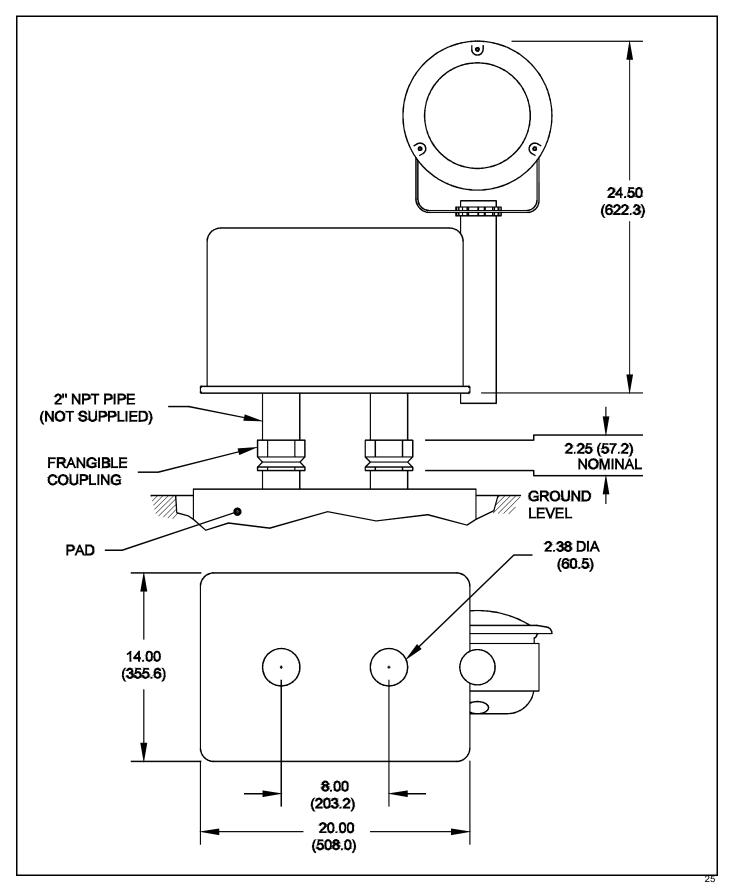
Comounted Lighting Unit — Mounting and Outline
